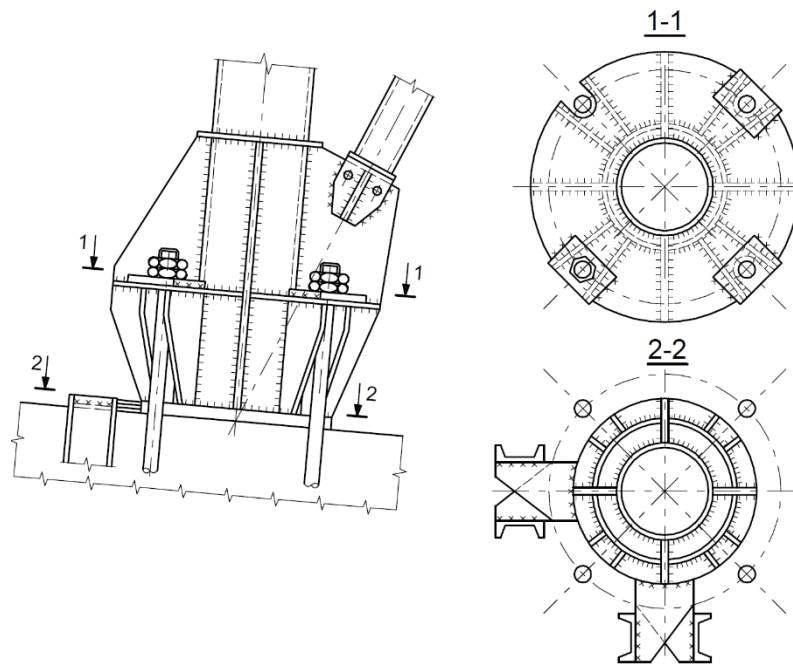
Tower support unit with tubular cross-section elements with four anchor bolts
